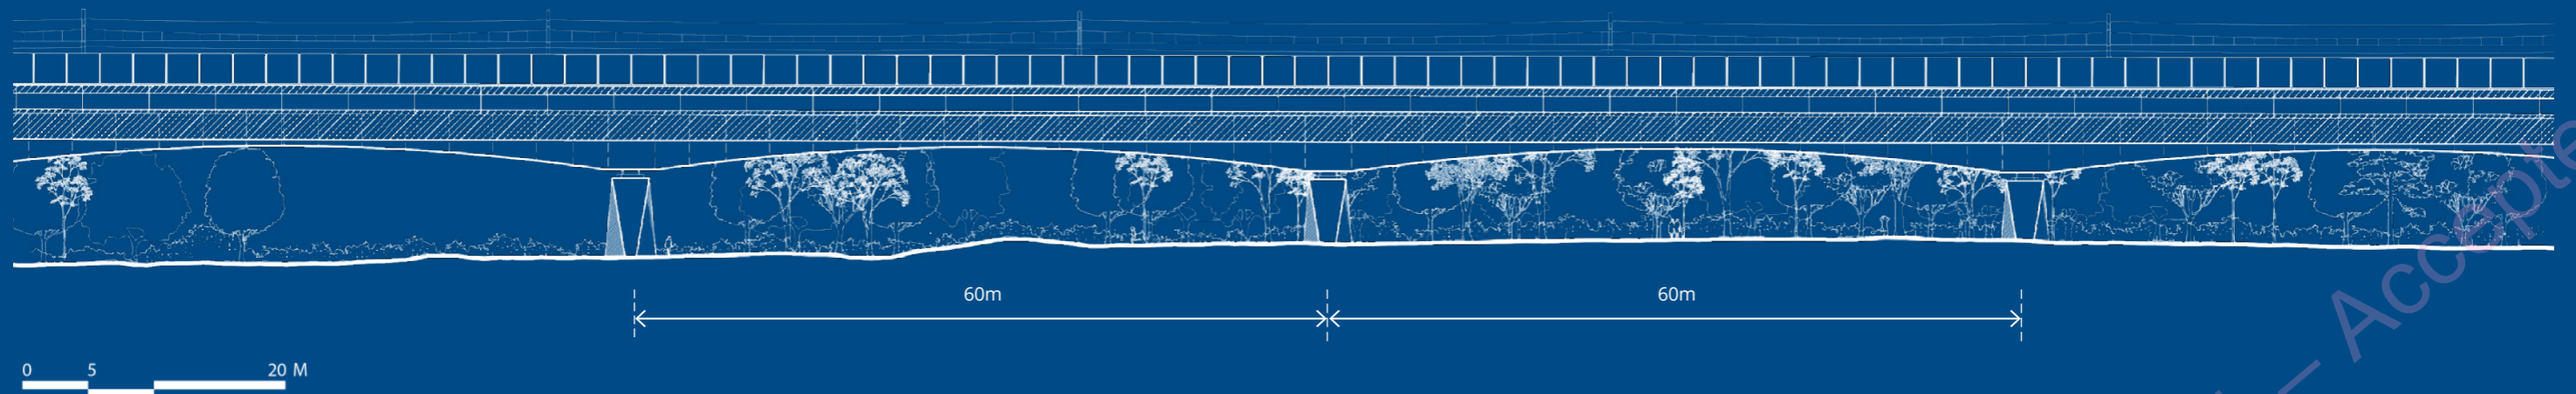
\_ Proposed elevation - Typical 60m spans between straight piers
